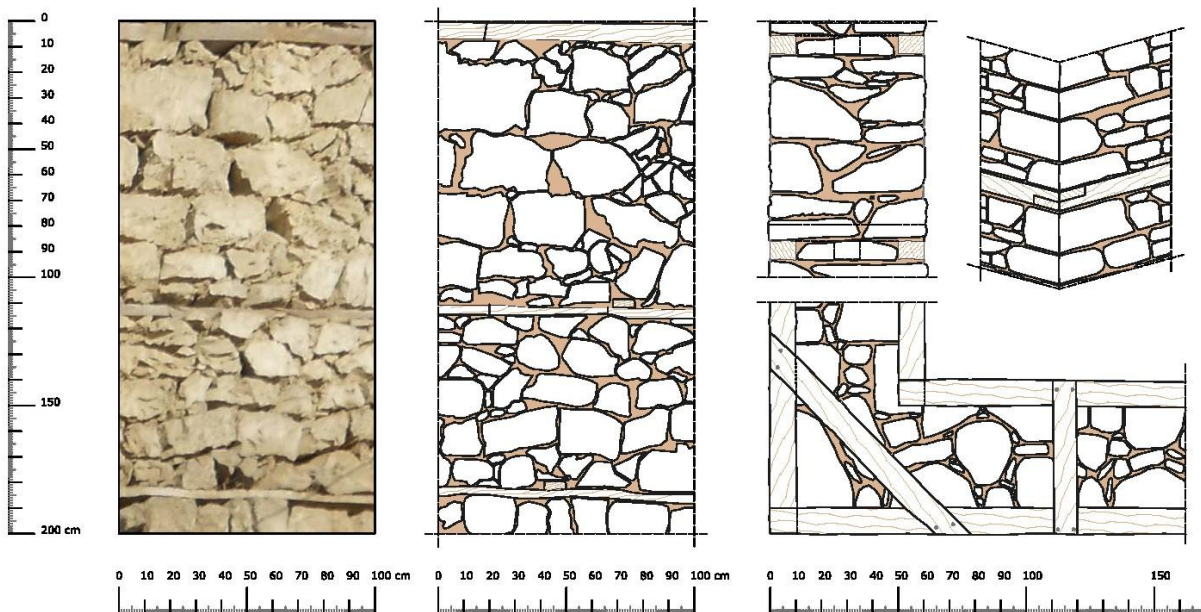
Mixed masonry with stone and wood. Source: drawing of the author.
